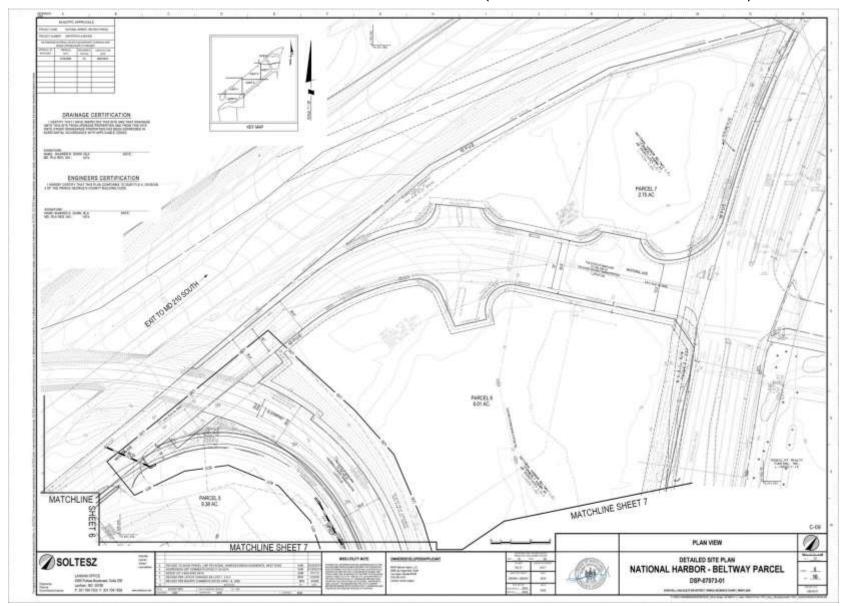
DETAILED SITE PLAN SET (PAGE 7 OF 10)
